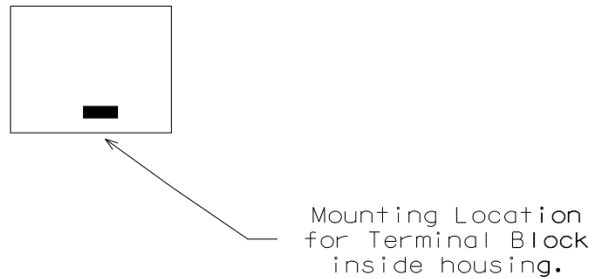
1 SECTION TERMINAL BLOCK MOUNTING LOCATION FOR STANDARD SIGNAL HEADS AND OPTICAL SIGNAL HEADS
